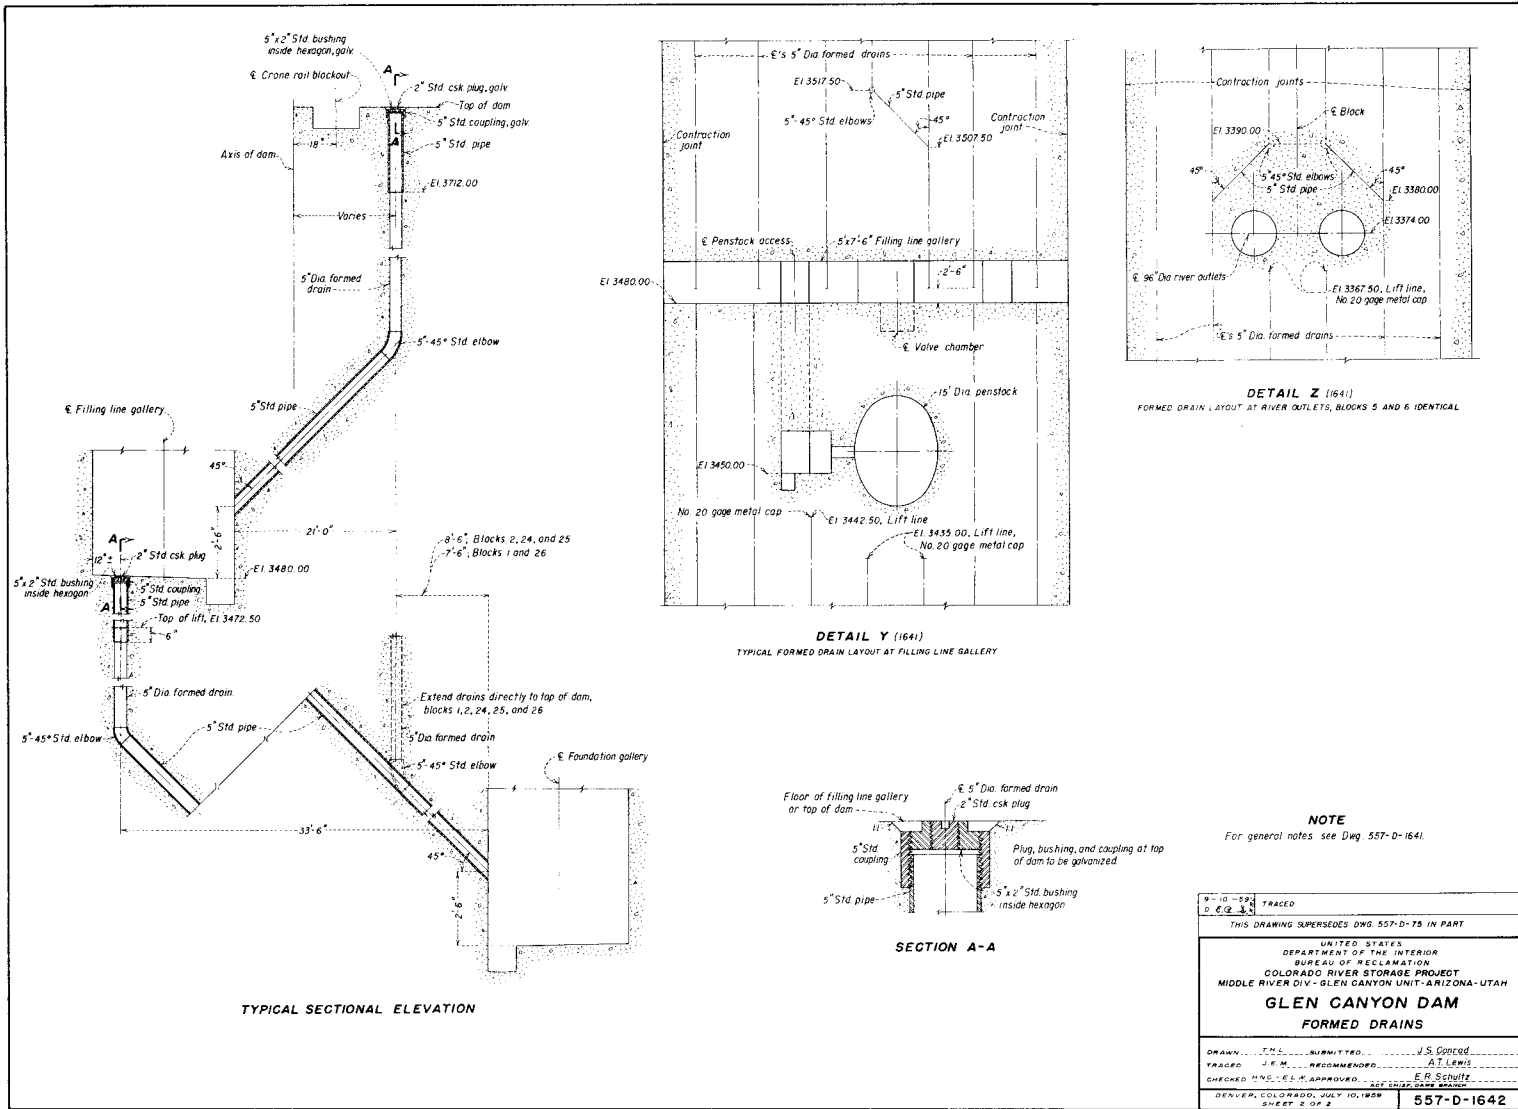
Formed drains in dam. (Sheet 2 of 2.)
